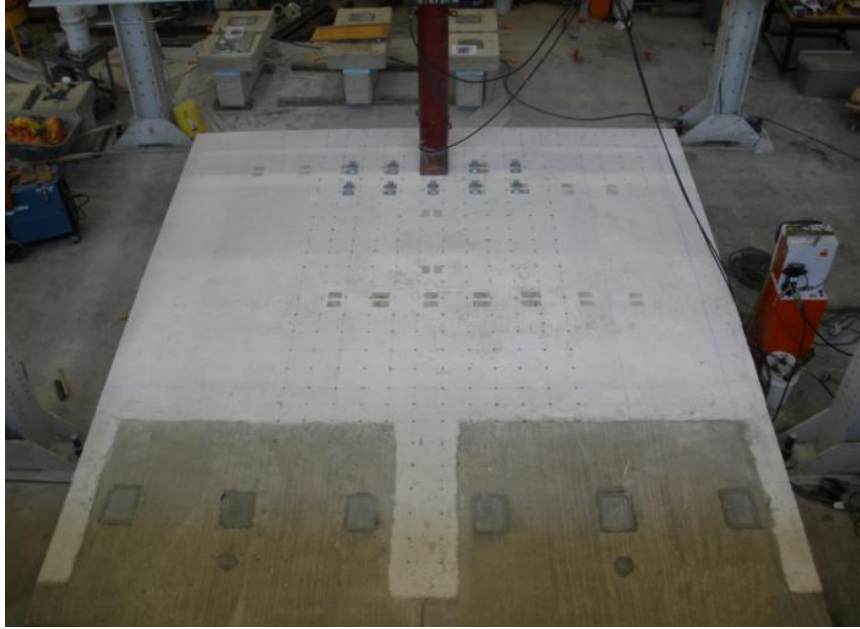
Photograph of the Bridge Deck in the Laboratory.
